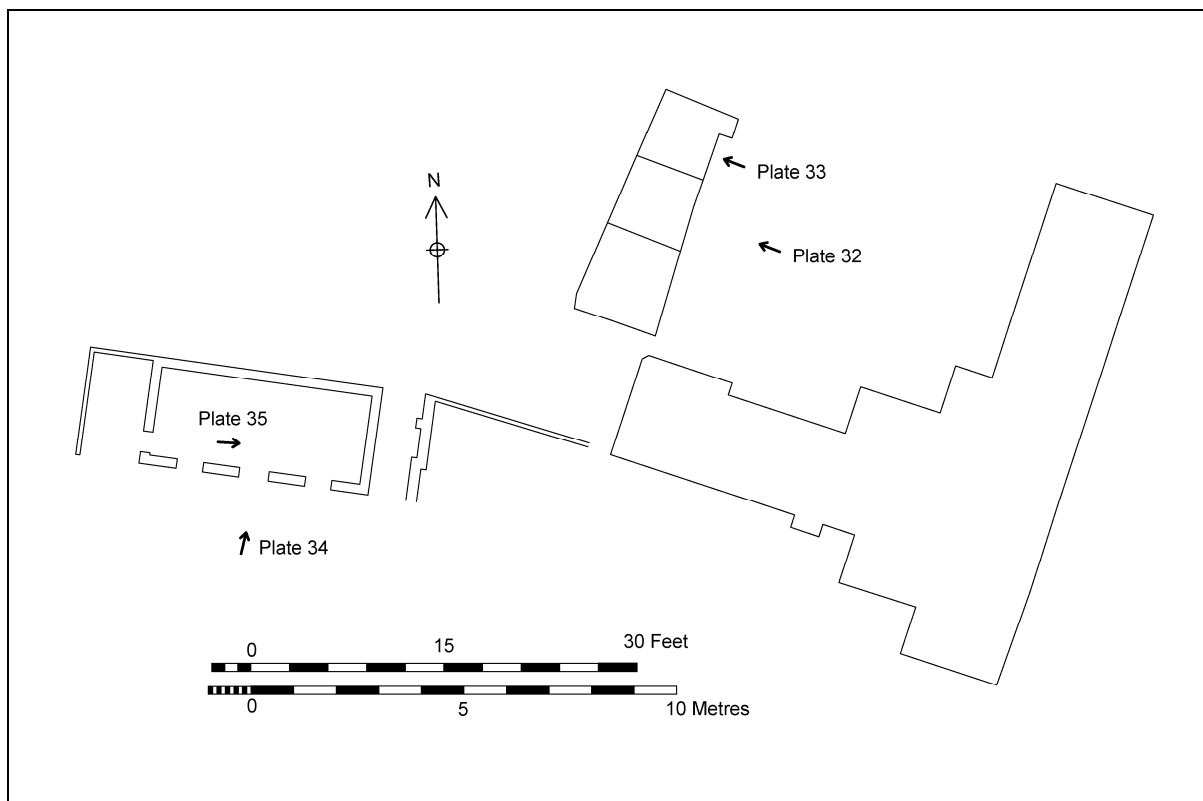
Block plan of stables and cow shed at western side of farmstead, with locations of plates 32-35 added.
